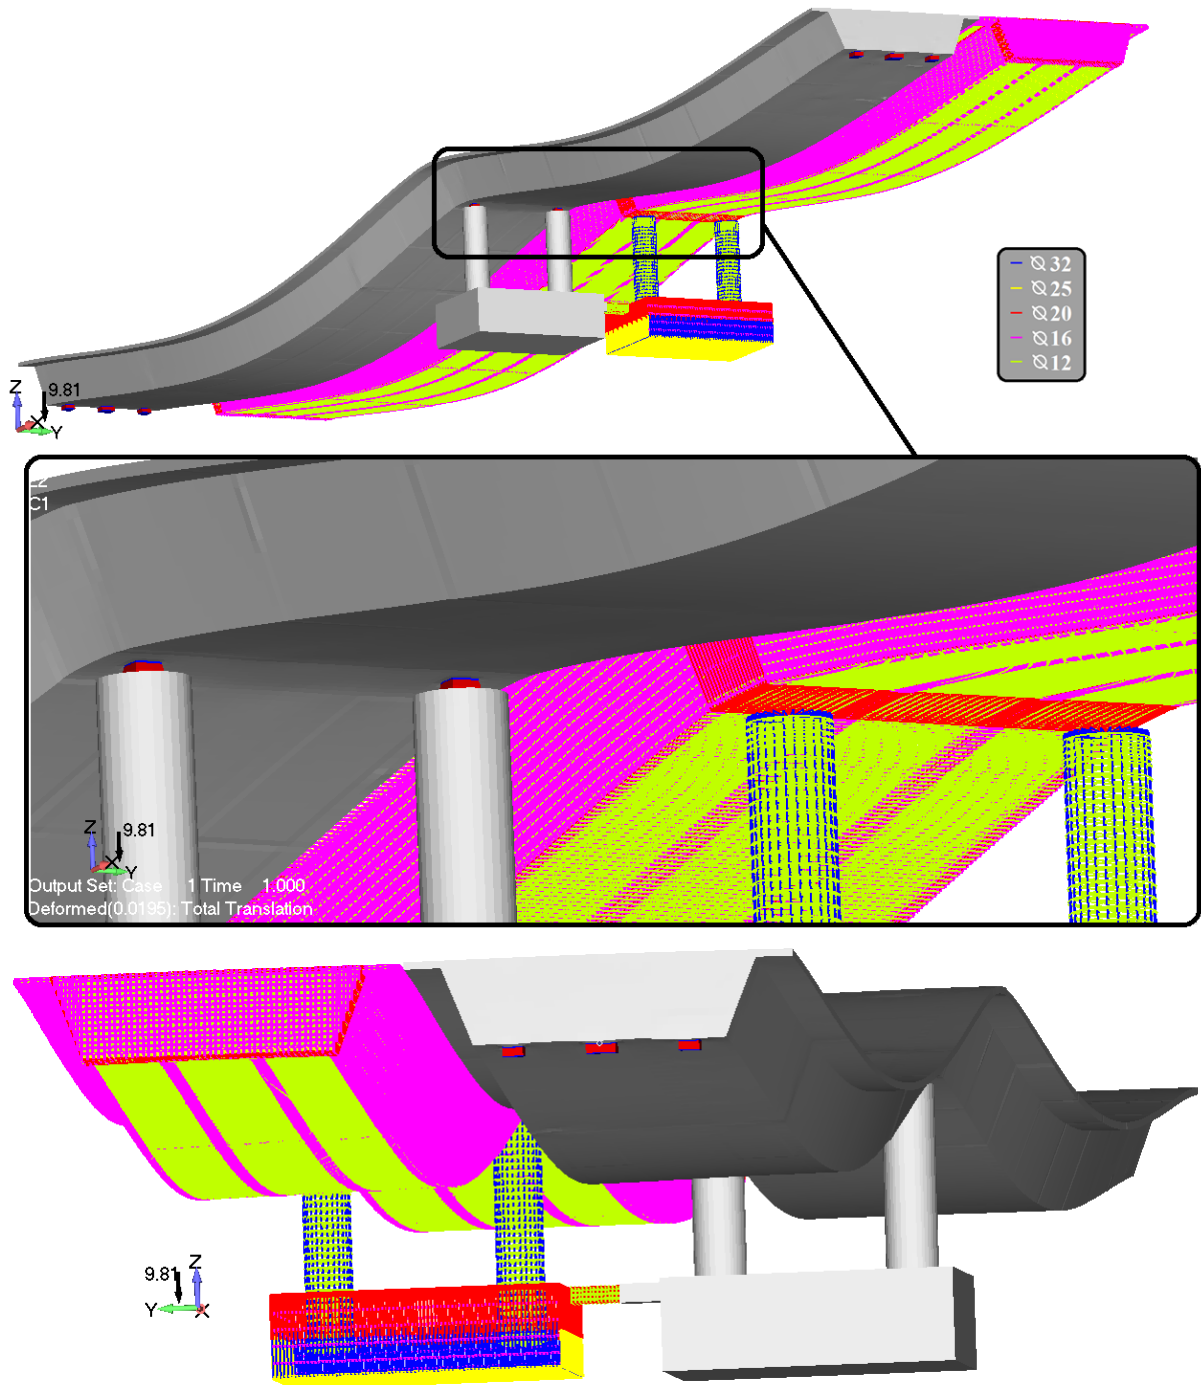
Double Deck RC Bridge. Deformed shape of the hexahedral and embedded rebar FE meshes.
